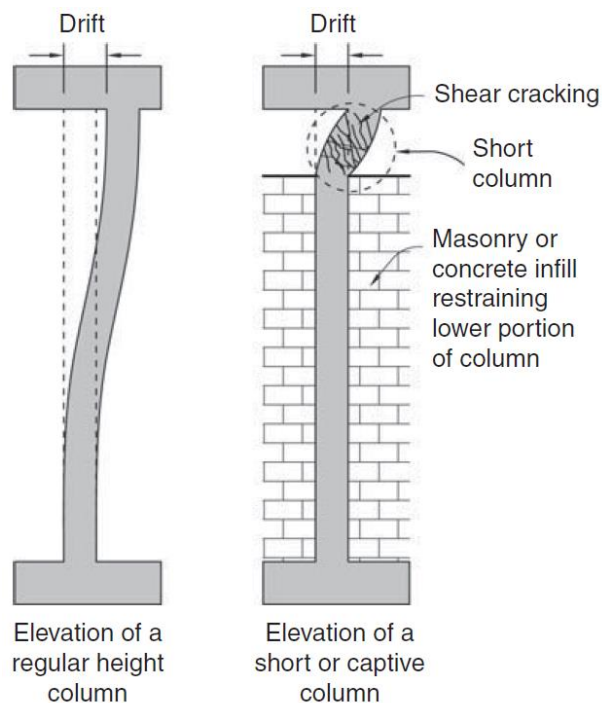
Short Column Occur When a Column is Partially Restricted from Deflecting Leading to Potential Damage in Form of Shear Cracking in the Unrestricted portion of the Column Under Lateral Force (Charleson, 2008)
